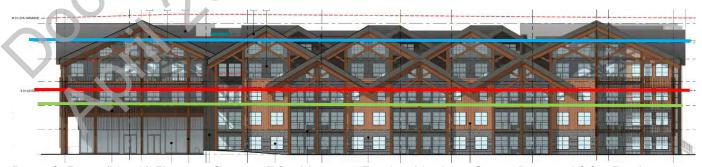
Front (North) Elevation Showing 7.0m Maximum Eaveline Height in Green, Proposed 9.0m Eaveline Height in Red, and 16.0m Maximum Building Height in Blue.
